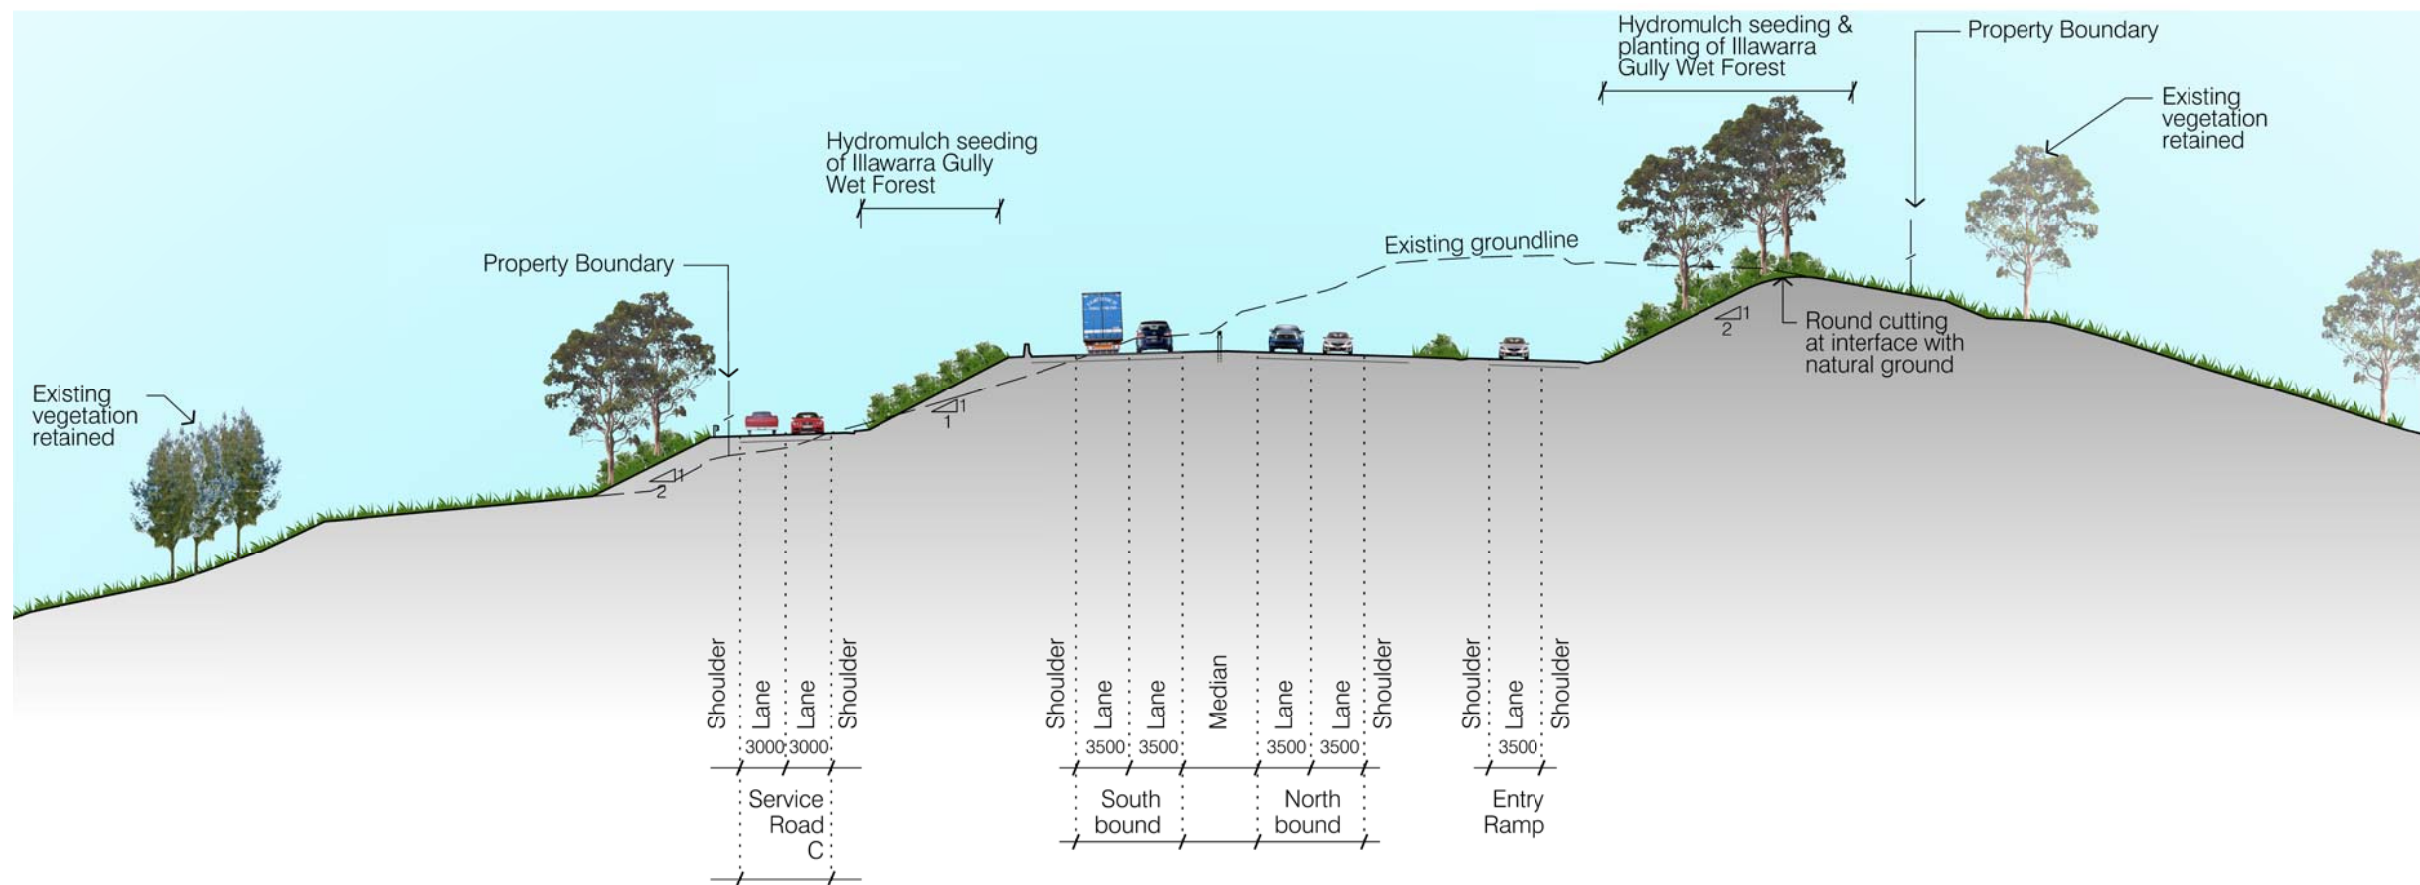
Road cross section at Ch. 15400 (Scale 1:500 @ A3)
